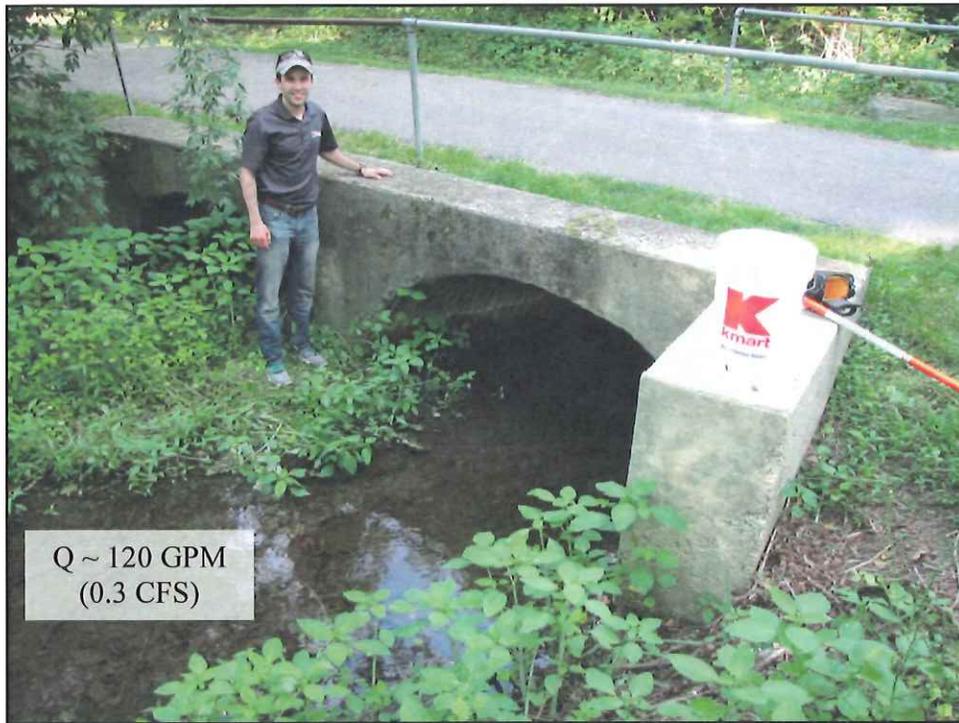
(05/31/14): Concrete Sill ~170-FT Downstream of Canal Intake
